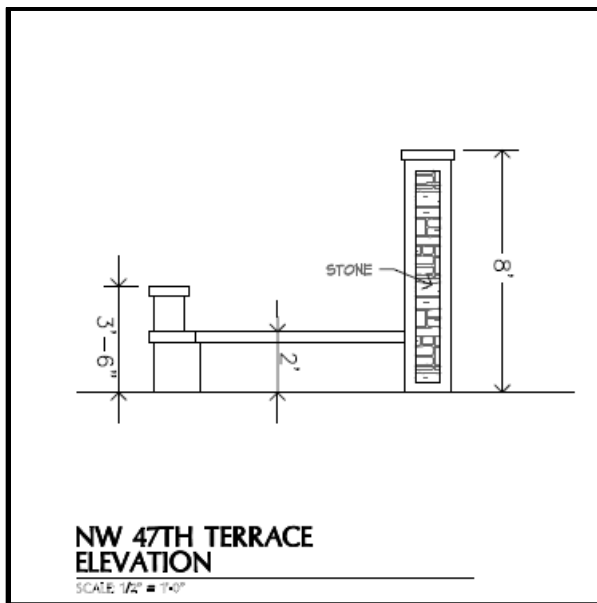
Proposed monument sign with dimensions and sign materials (NW 47th Terrace elevation)
